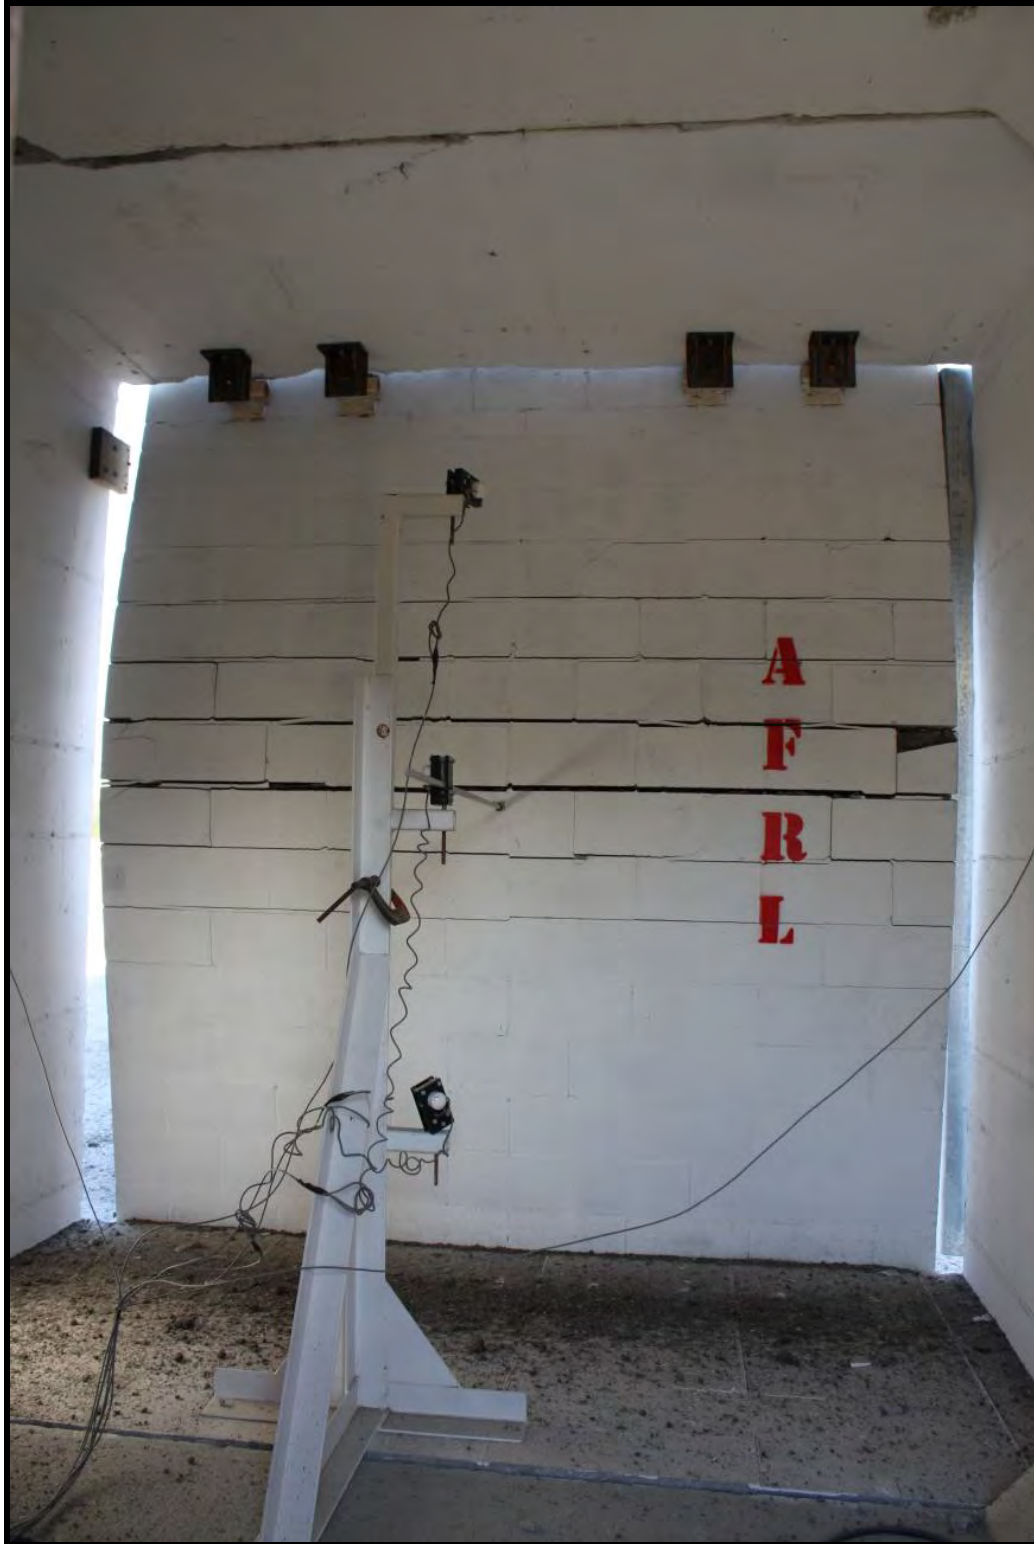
Experiment 1 6-inch CMU panel full interior view
